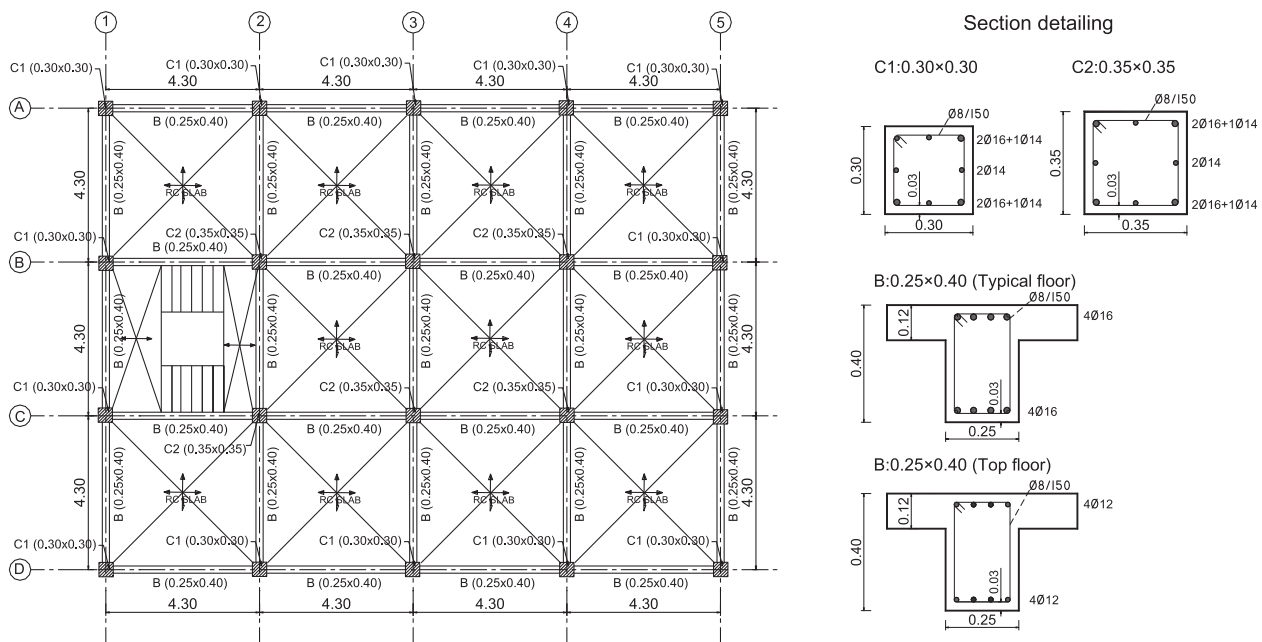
Plan view of a typical storey of the three buildings and design details of the end sections of the elements (all dimensions are in m).
